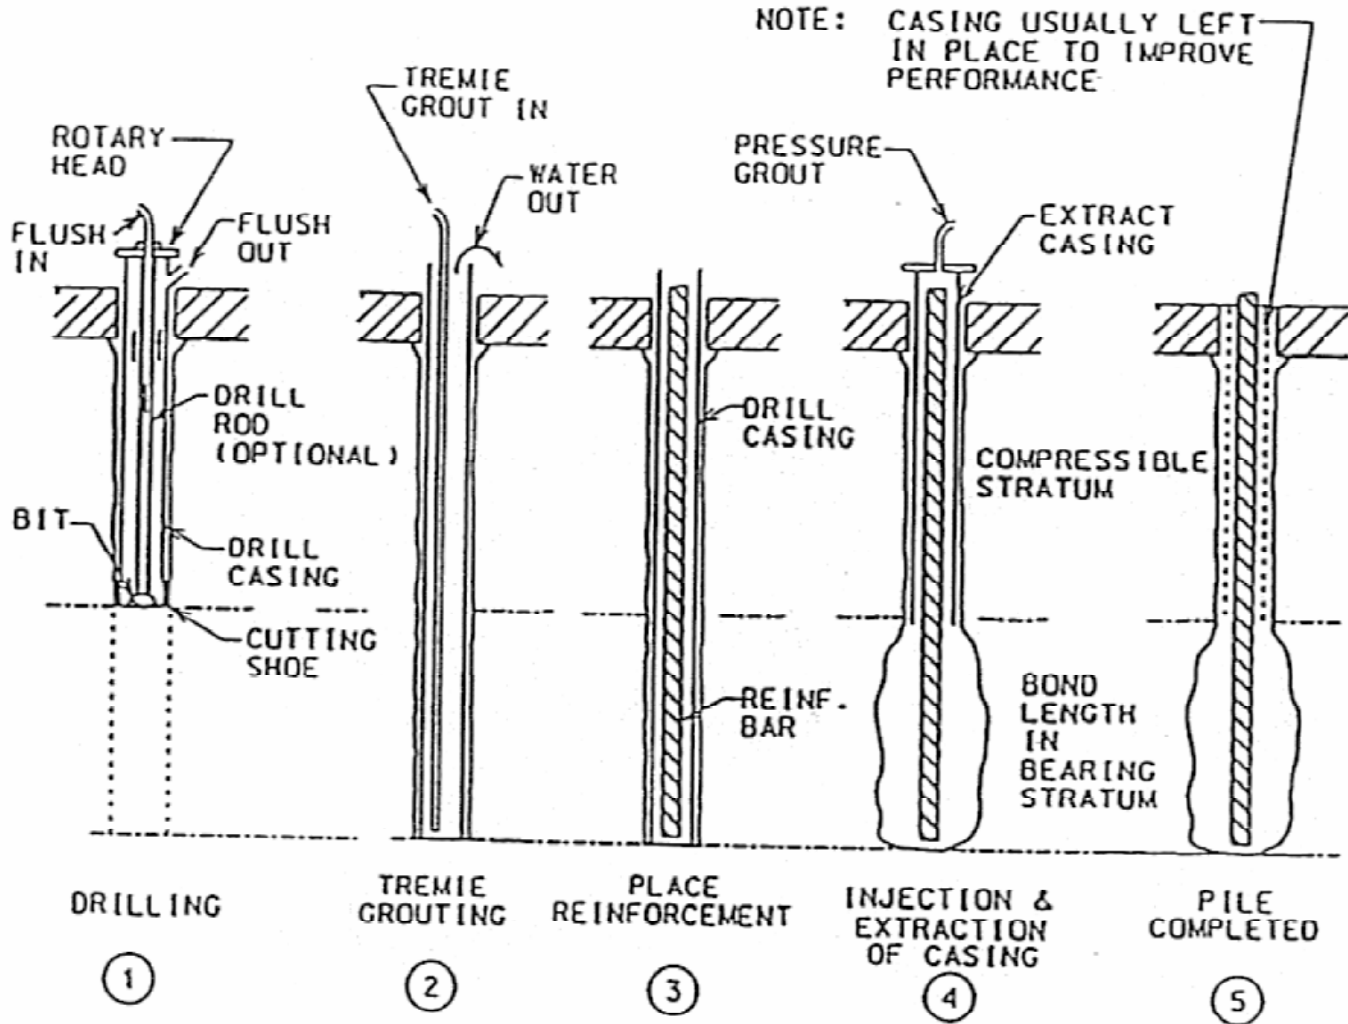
Stages in the construction of a typical Pin Pile in soil.
